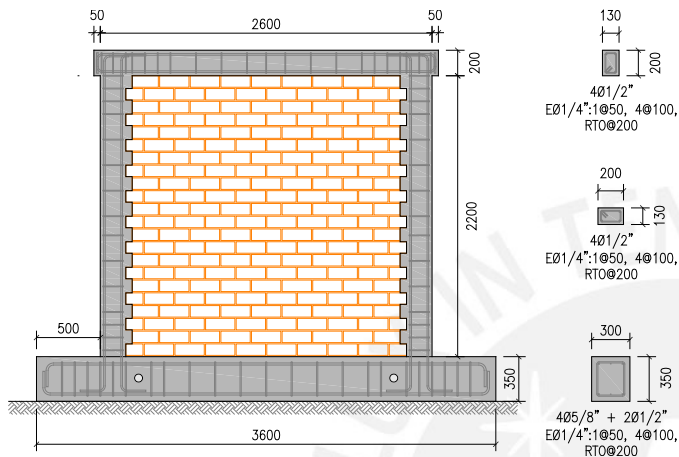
Geometry and reinforcement detail of a typical wall (dimensions in millimeters)
